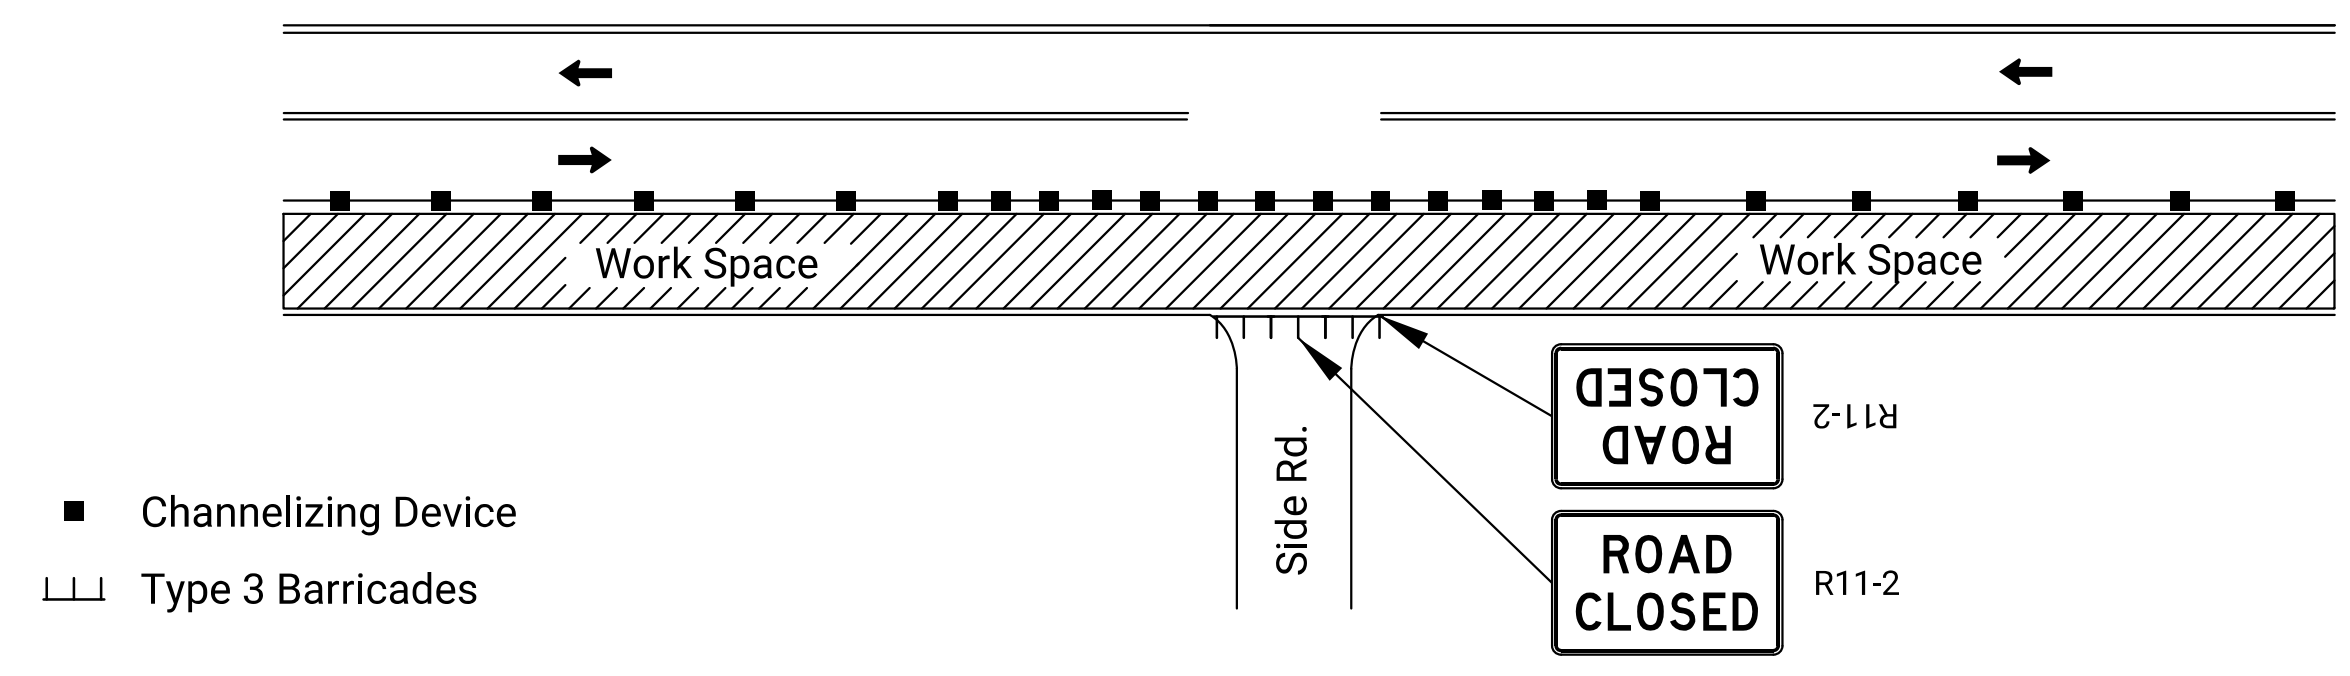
SIDE ROAD OR ENTRANCE CLOSED THROUGH WORK AREA
